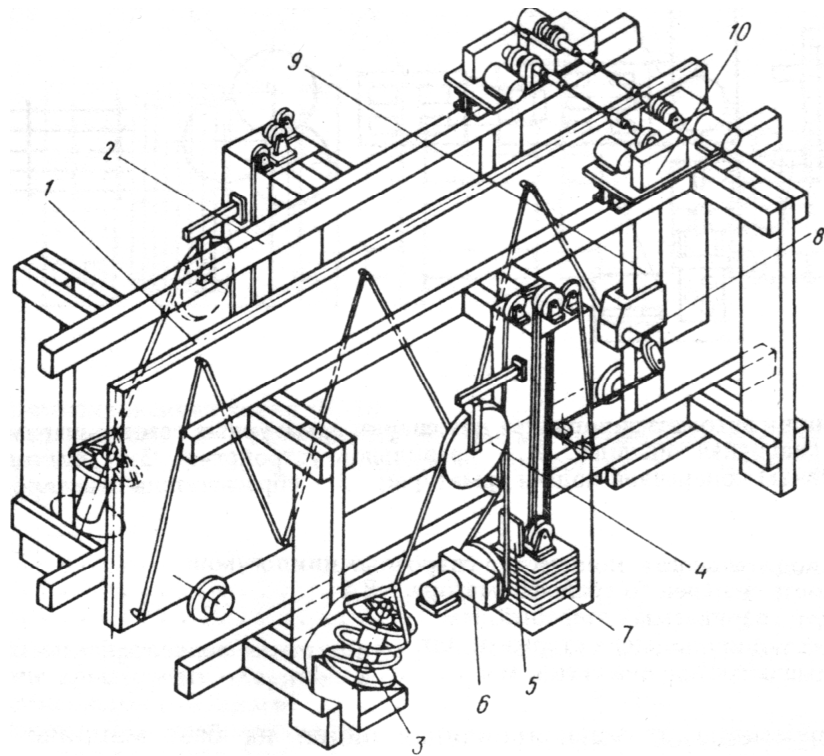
Installation of continuous reinforcing of panels on cassette-conveyor line: 1 - mould; 2 - upper guide beam; 3 - coil-unwinding machine; 4 -lead block; 5 - stops; 6 - axis drive system; 7 - wire bridling installation; 8 - tail spindle; 9 - traverse beam; 10 - traverse beam move mechanism.
